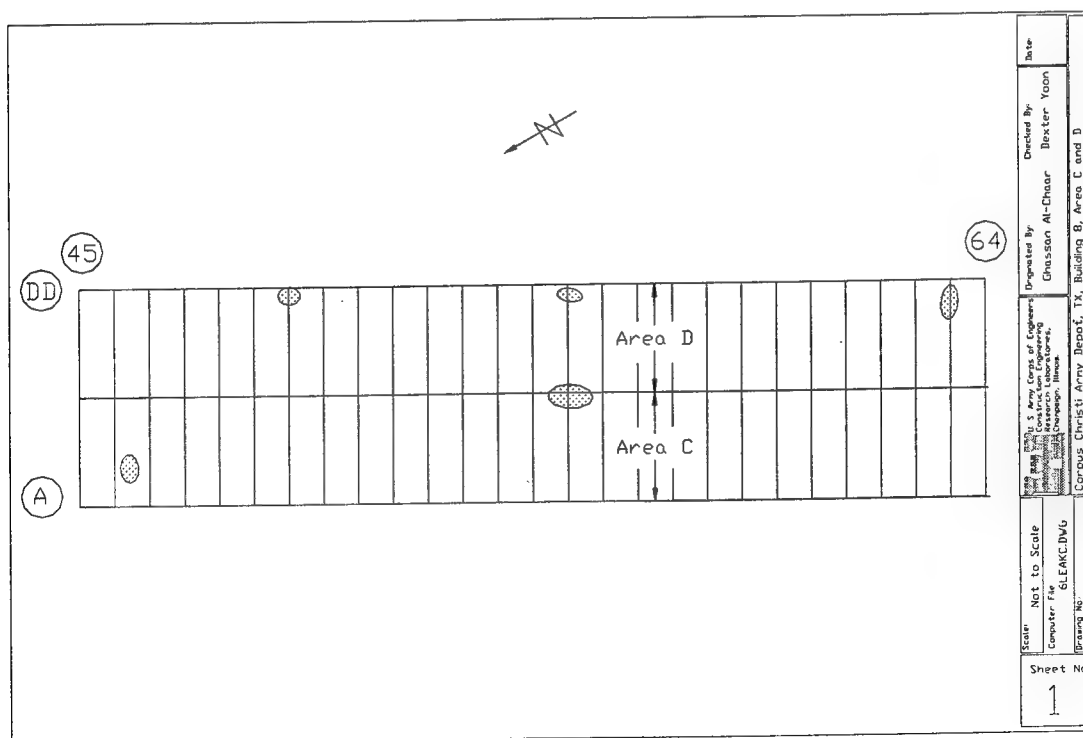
Location of leak traces and roof surfaces collecting water in Areas C and D.
